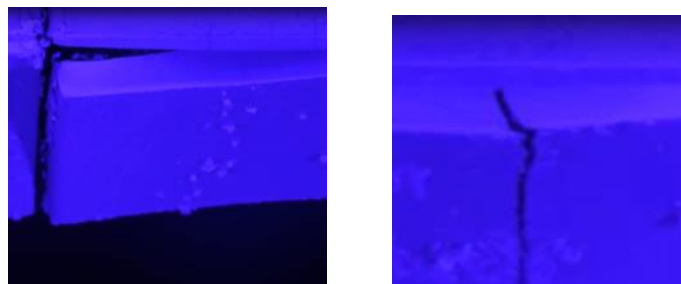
Delamination and cracking action of Gypsum Board at seam Column 2 during heating.
